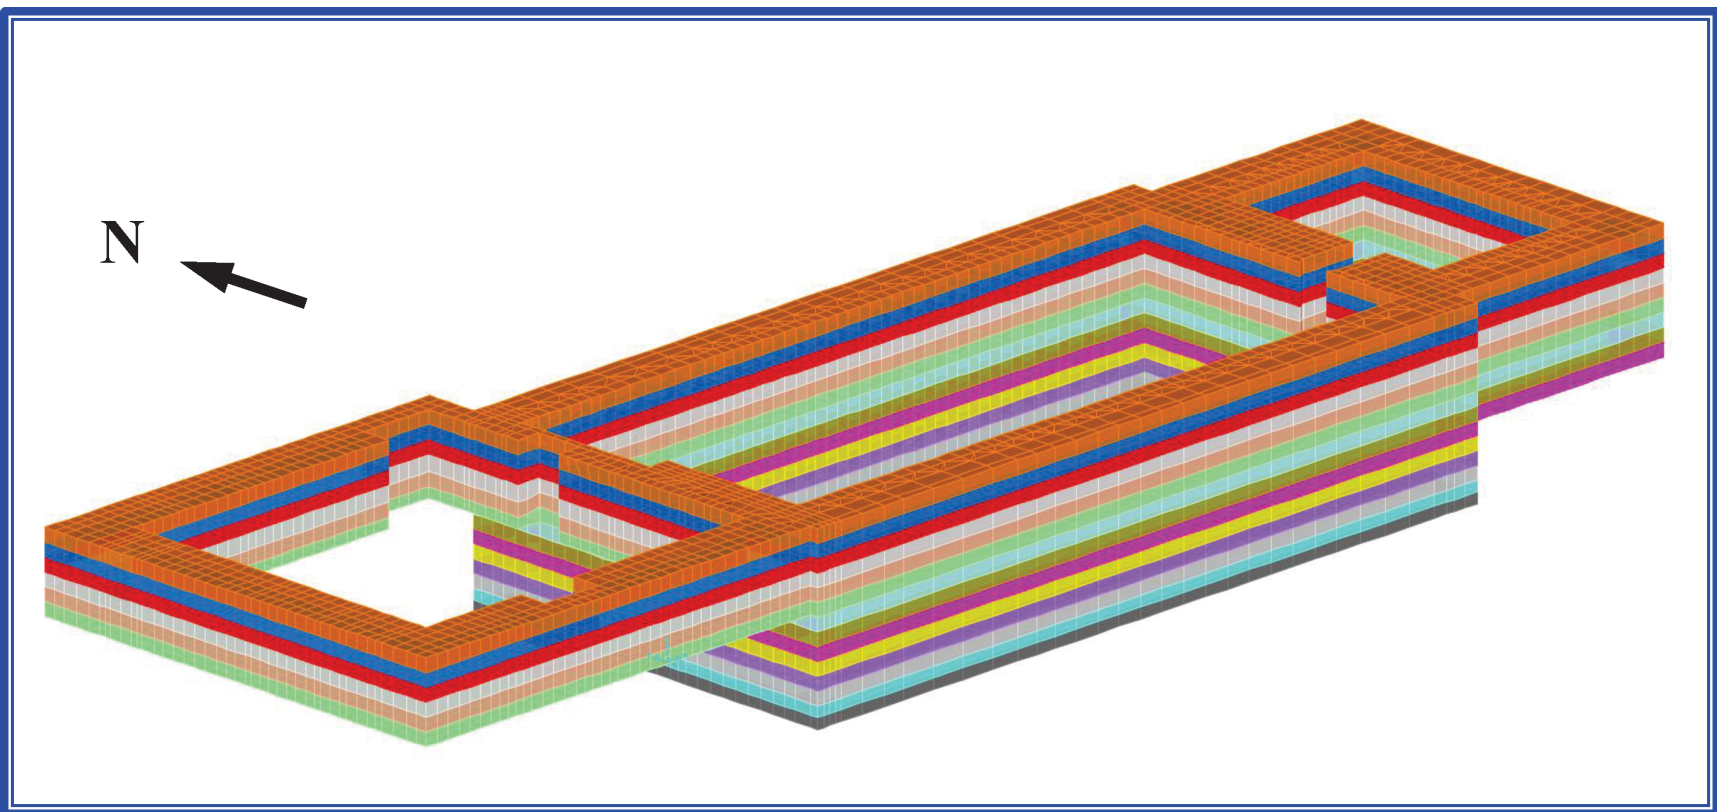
Beam Elements of Triple Building SAP2000 Model
